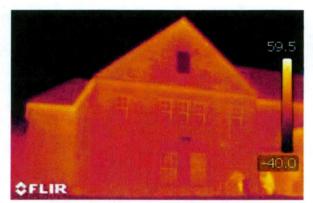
Exterior thermographic image shows warm air exfiltration at multiple exterior wall locations.
